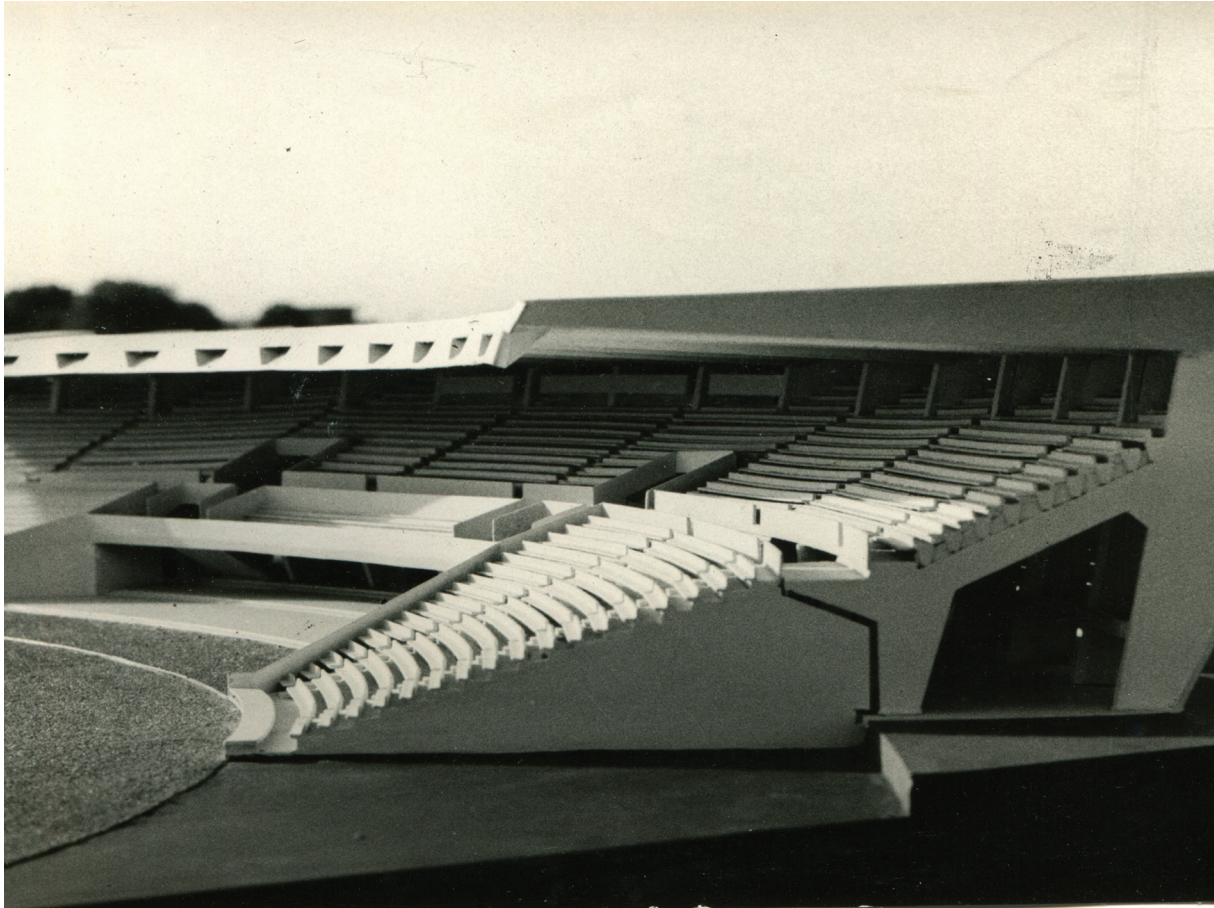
Archival photograph of the model of the South Pavilion with structural details as seen on site
